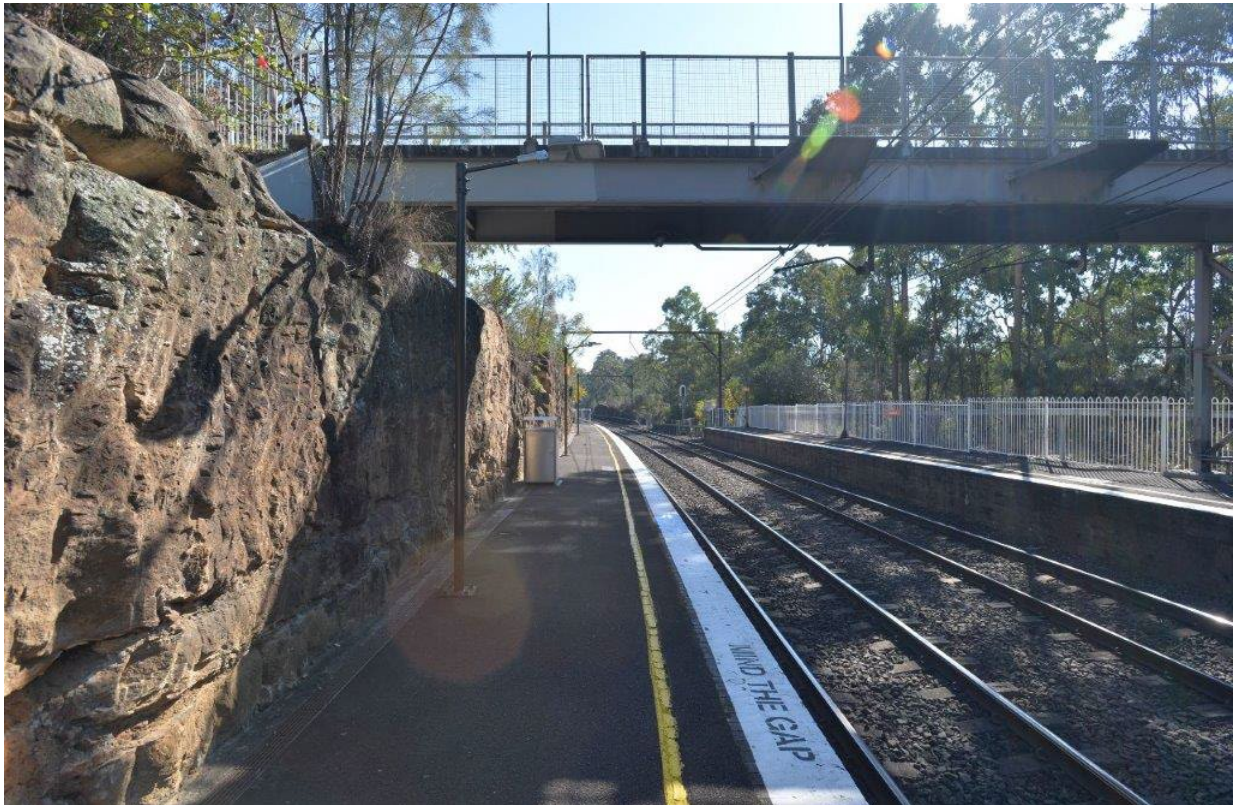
View looking north from Platform 1 of the sandstone cutting and footbridge
